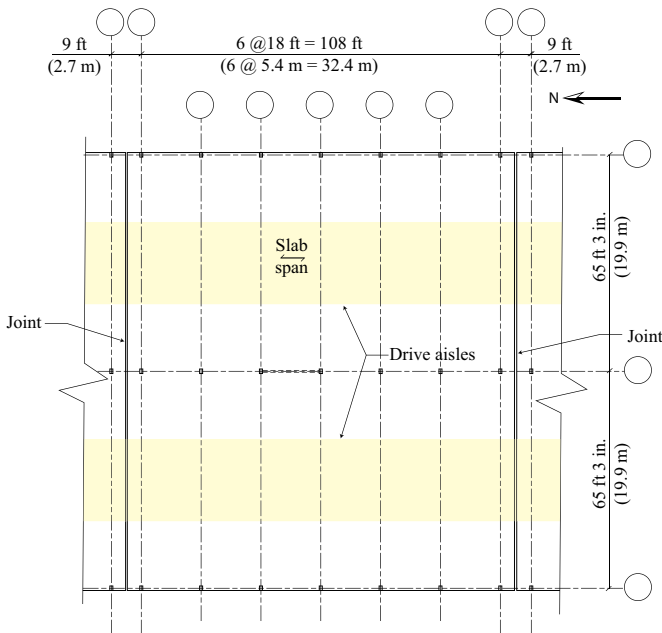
Schematic plan of deck bays between expansion joints. Post-tensioning strand anchorage strips are located near the joints. Transverse post-tensioned beams are at the east-west grid lines
